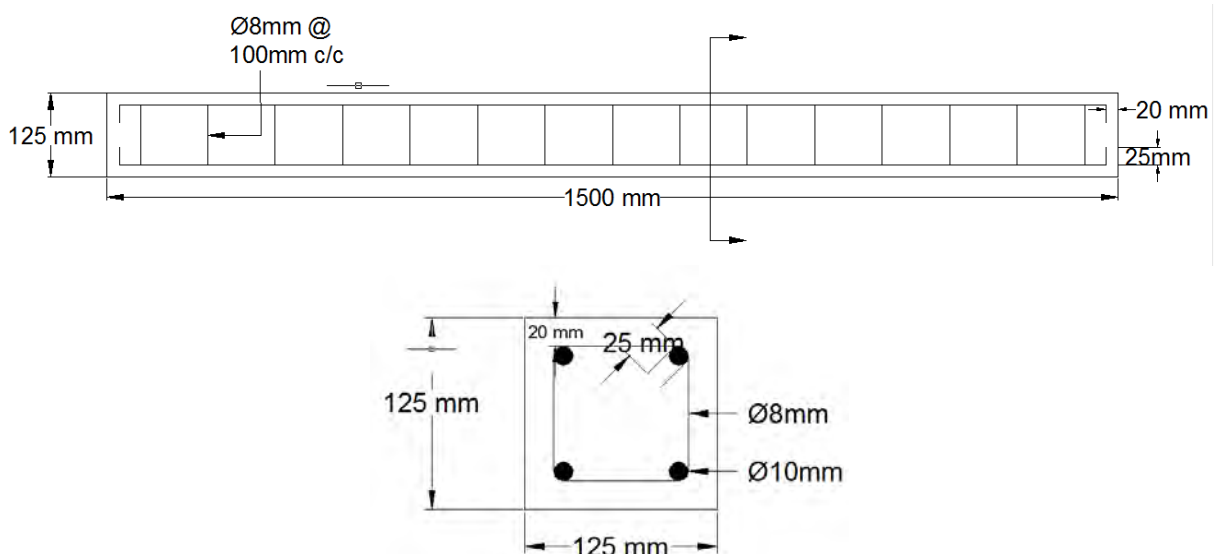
Dimensions and Detailing of Flexure Control Beam
